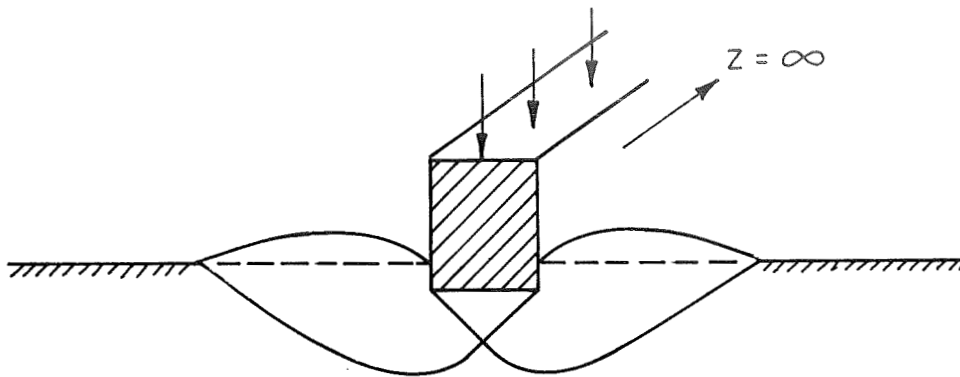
FAILURE PATTERN BENEATH AN INFINITELY LONG, STATICALLY LOADED STRIP FOOTING
